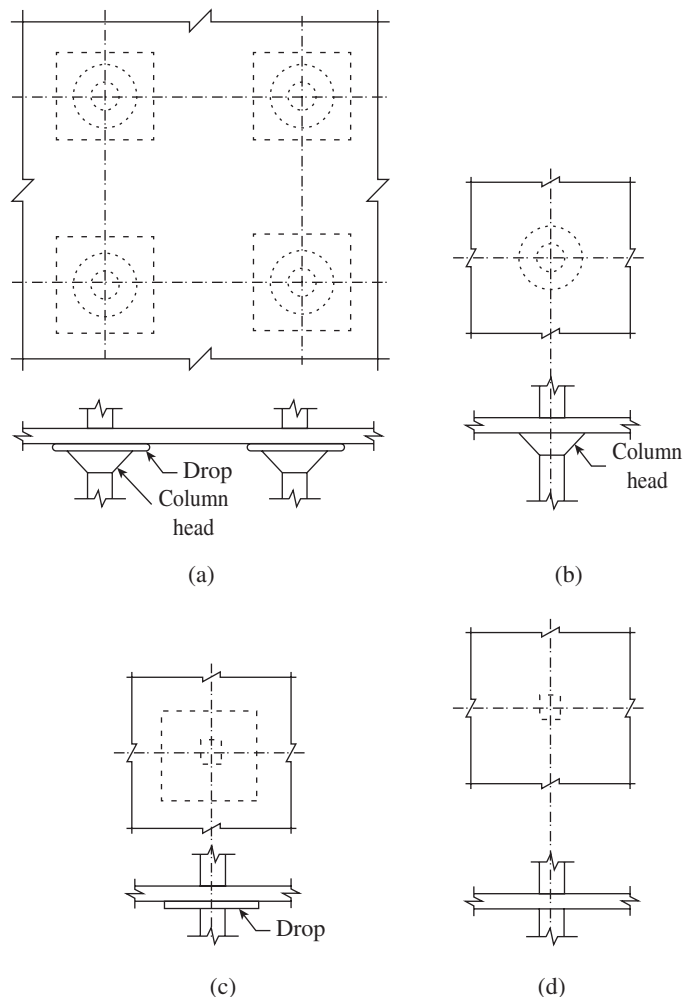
Flat slabs and flat plates (a) Flat slab with drop and column head (b) Flat slab with column head (c) Flat slab with drop (d) Flat plate
